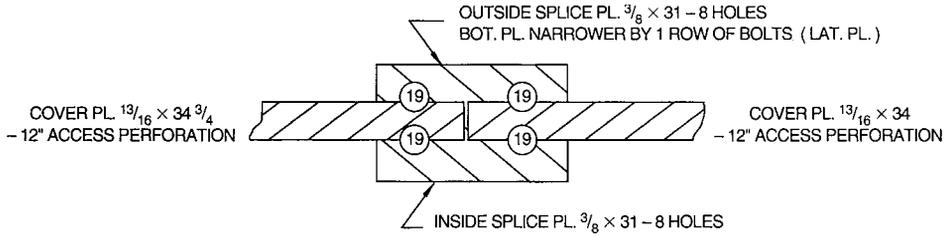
Cross section of chord cover-plate splice for example of load factor design.
